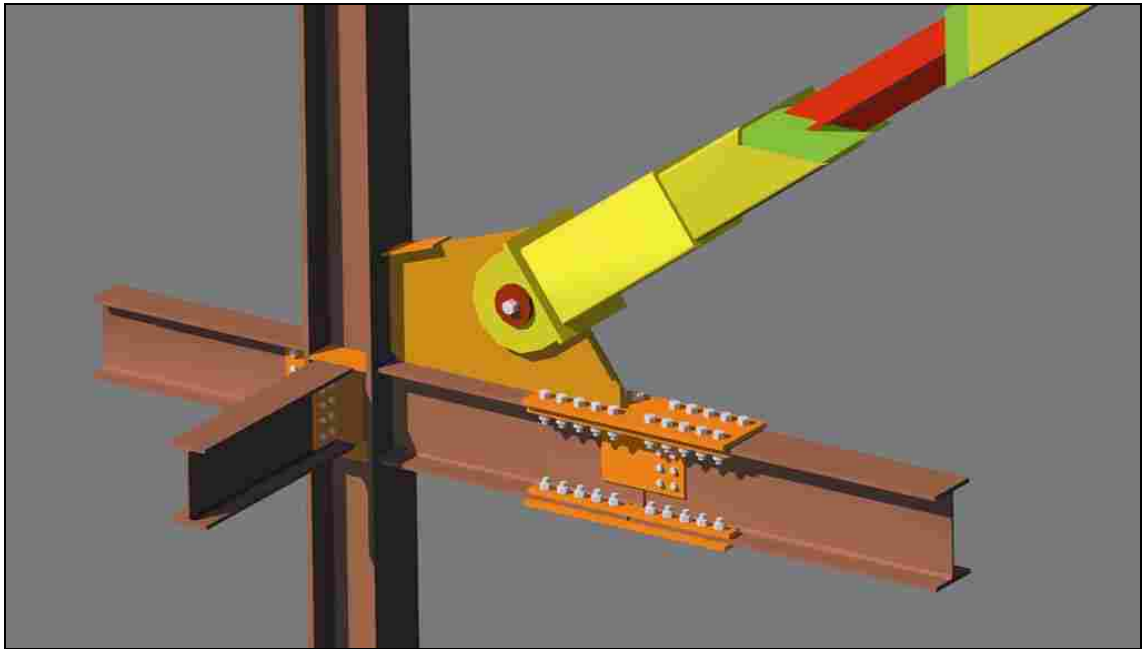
Proposed Connection: Utilizing a Hinge in the Beam (8)
